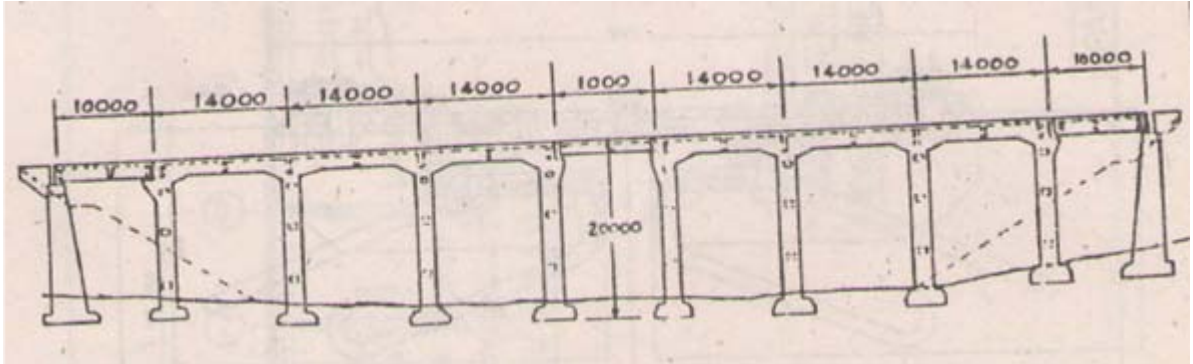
Framed Configuration For Railway Bridge (Viaduct)
